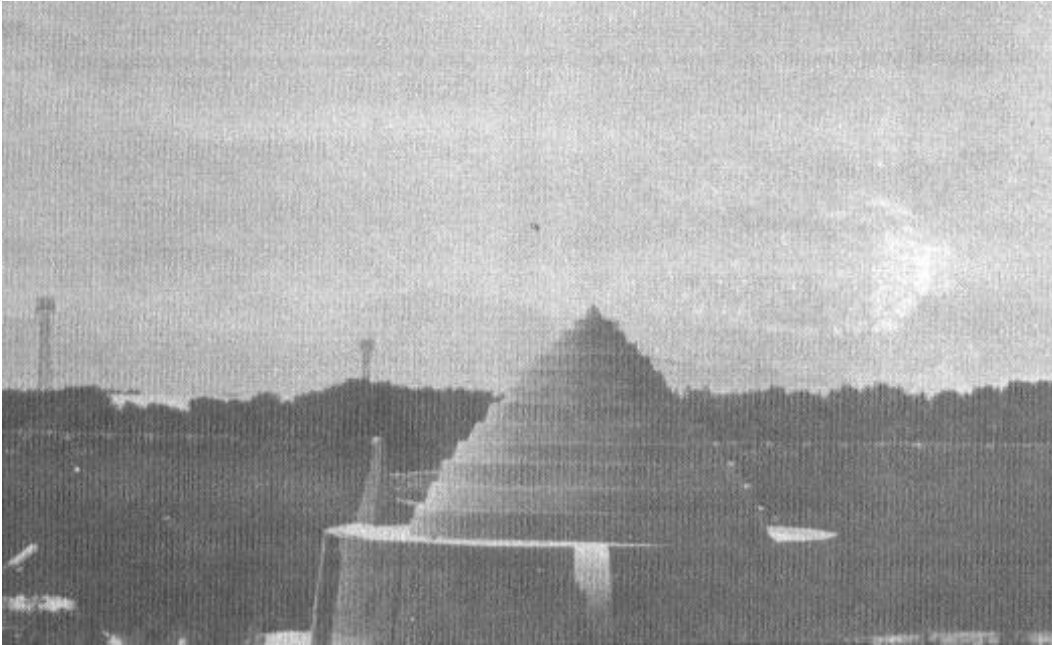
Dome shaped adobe icehouse supported by adobe buttresses survived seismic loading without damage.
